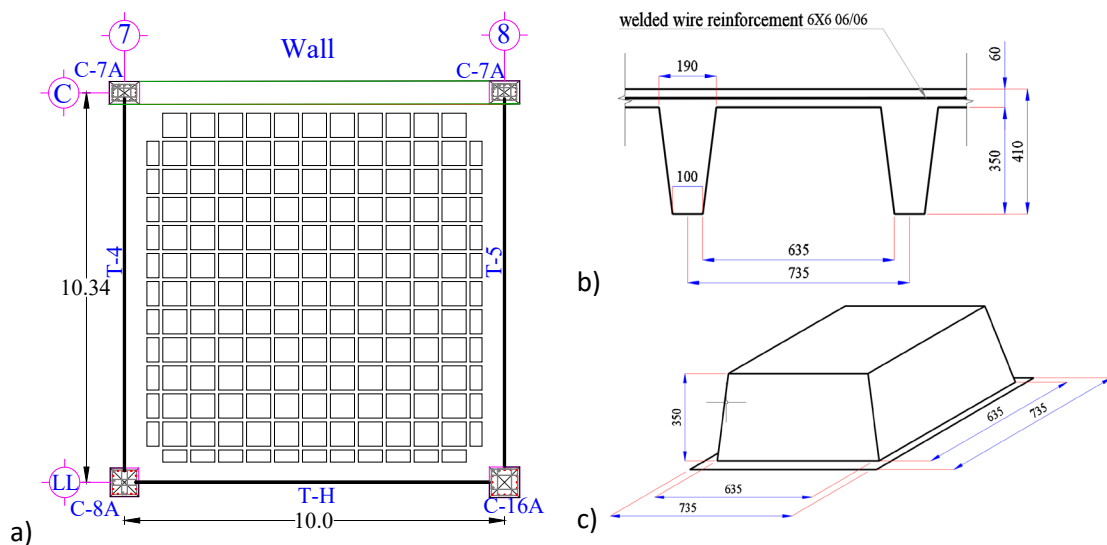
Details of: a) geometry of the interior waffle slab panel (m) and b) joist (mm) and c) dome dimensions (mm).
